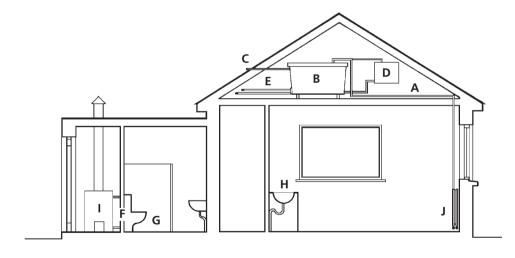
Typical elements of heating, plumbing and drainage systems.
